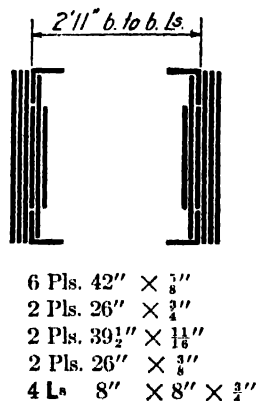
cc. Typical Bottom Chord Section for the 287-foot Span of the O.-W. R. R. & N. Co.'s Bridge over the Willamette River at Portland, Ore.
